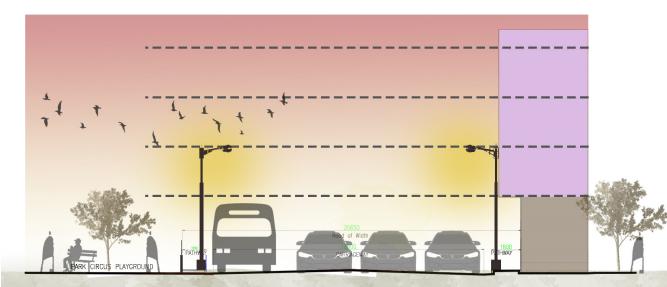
Existing Cross-section of 13M wide Orient Row Road
